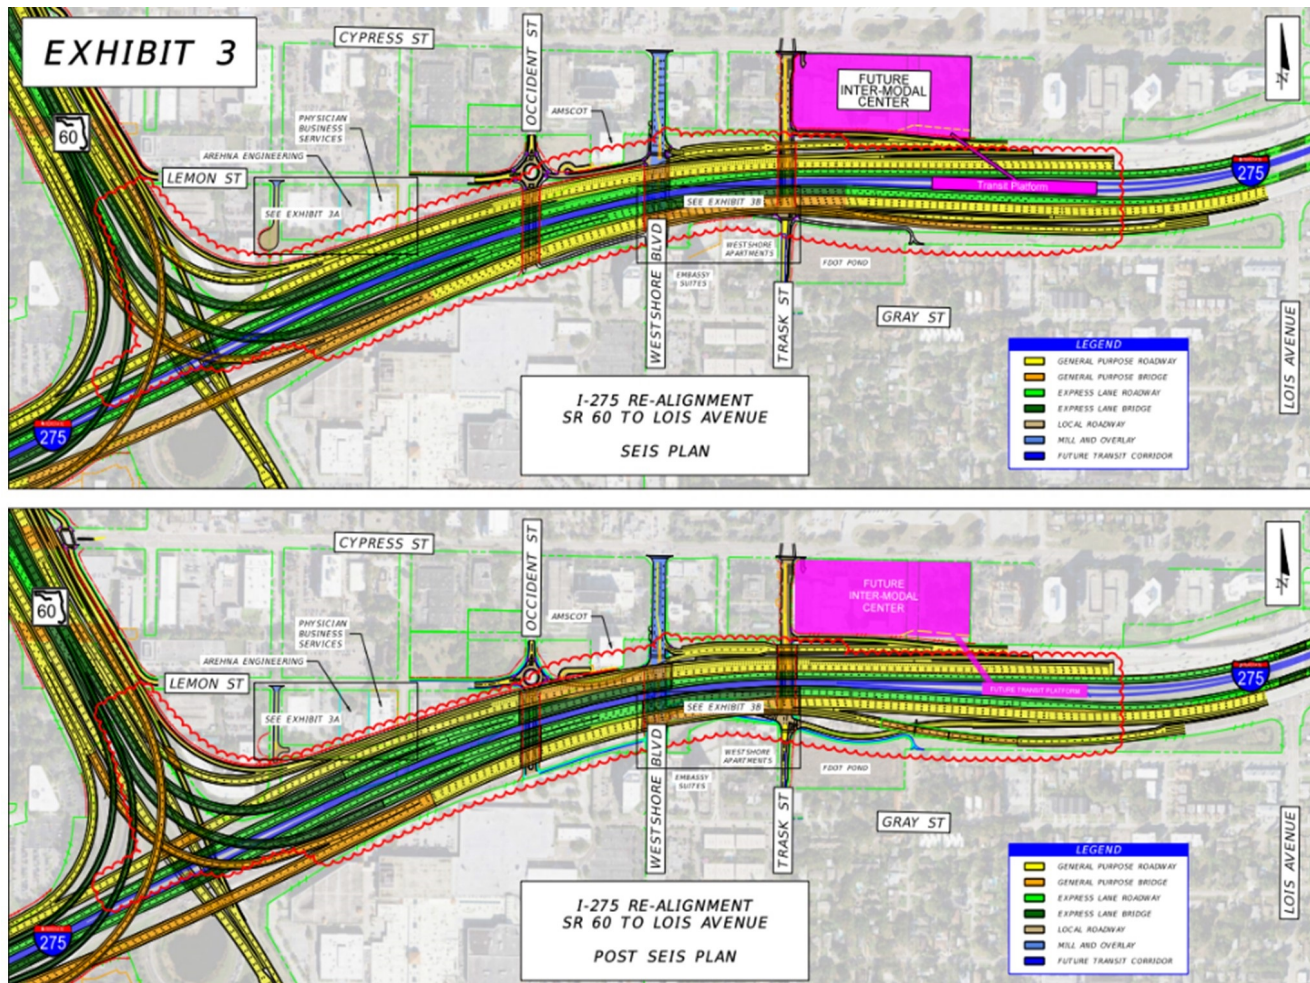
I-275 Re-alignment from SR 60 to Lois Avenue
